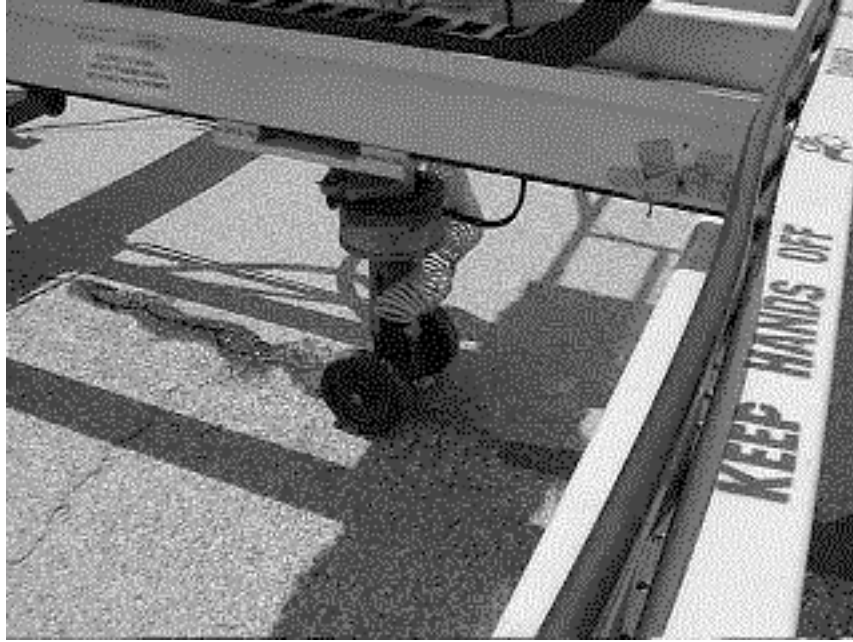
The ARMM Sealing a Longitudinal Crack
